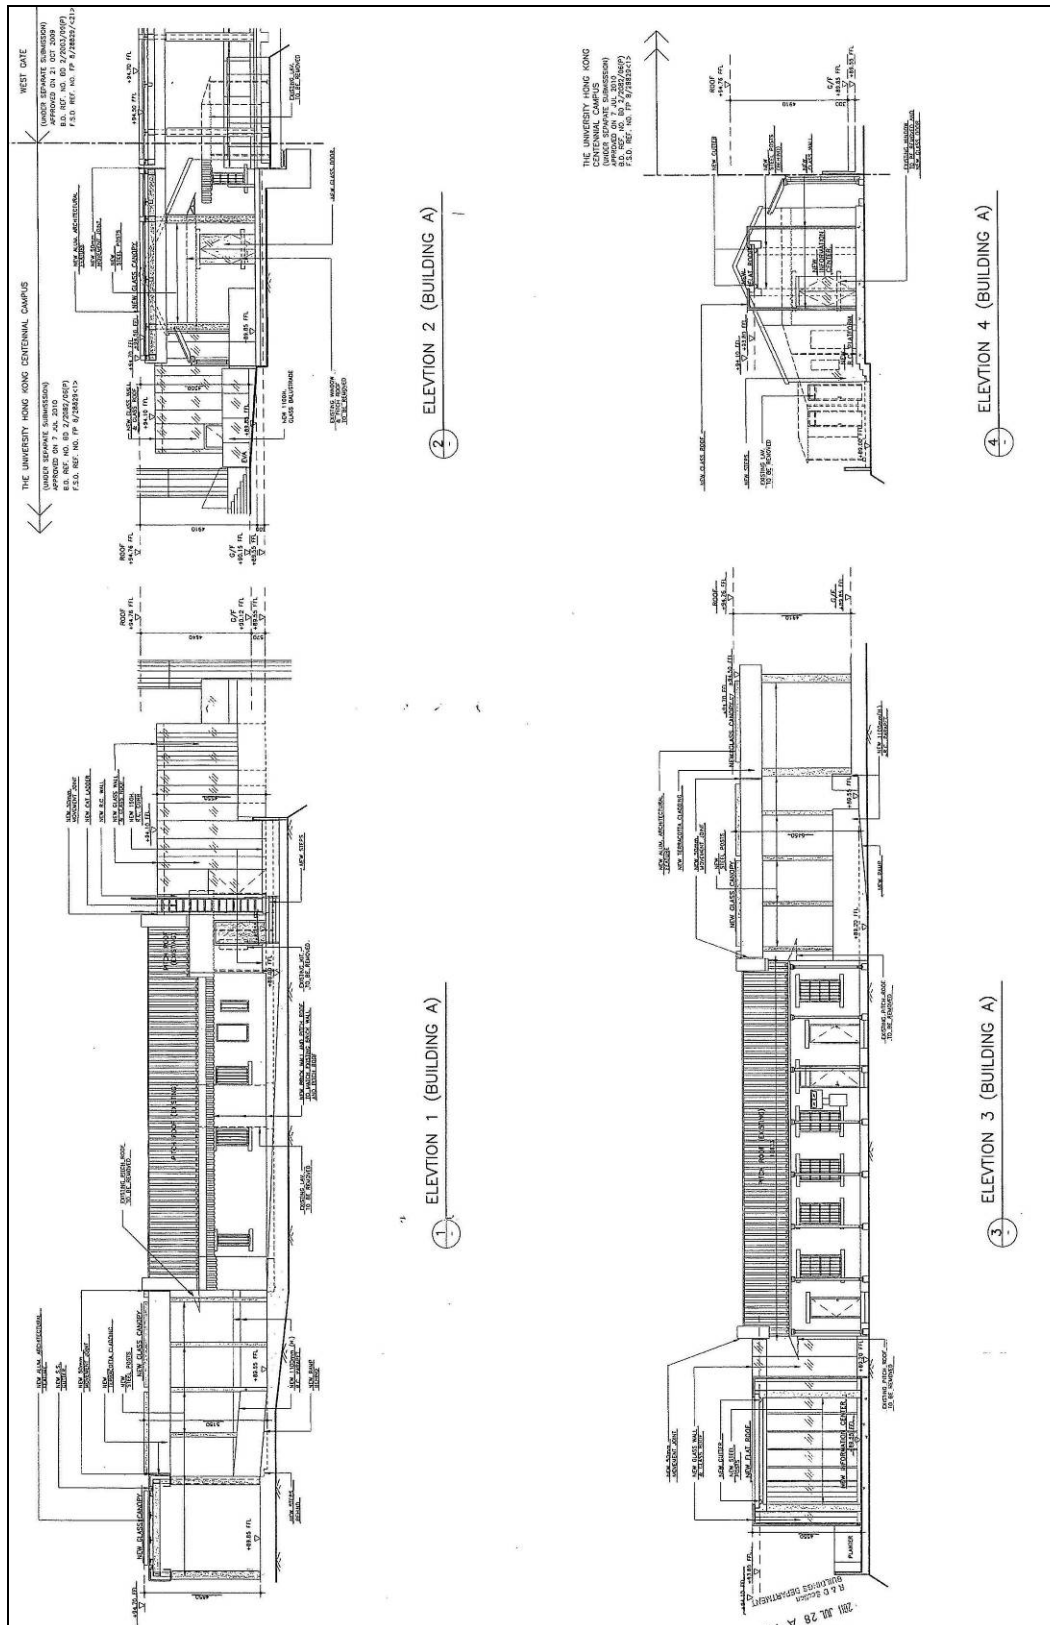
Elevation showing the proposed works at Workmen's Quarters
